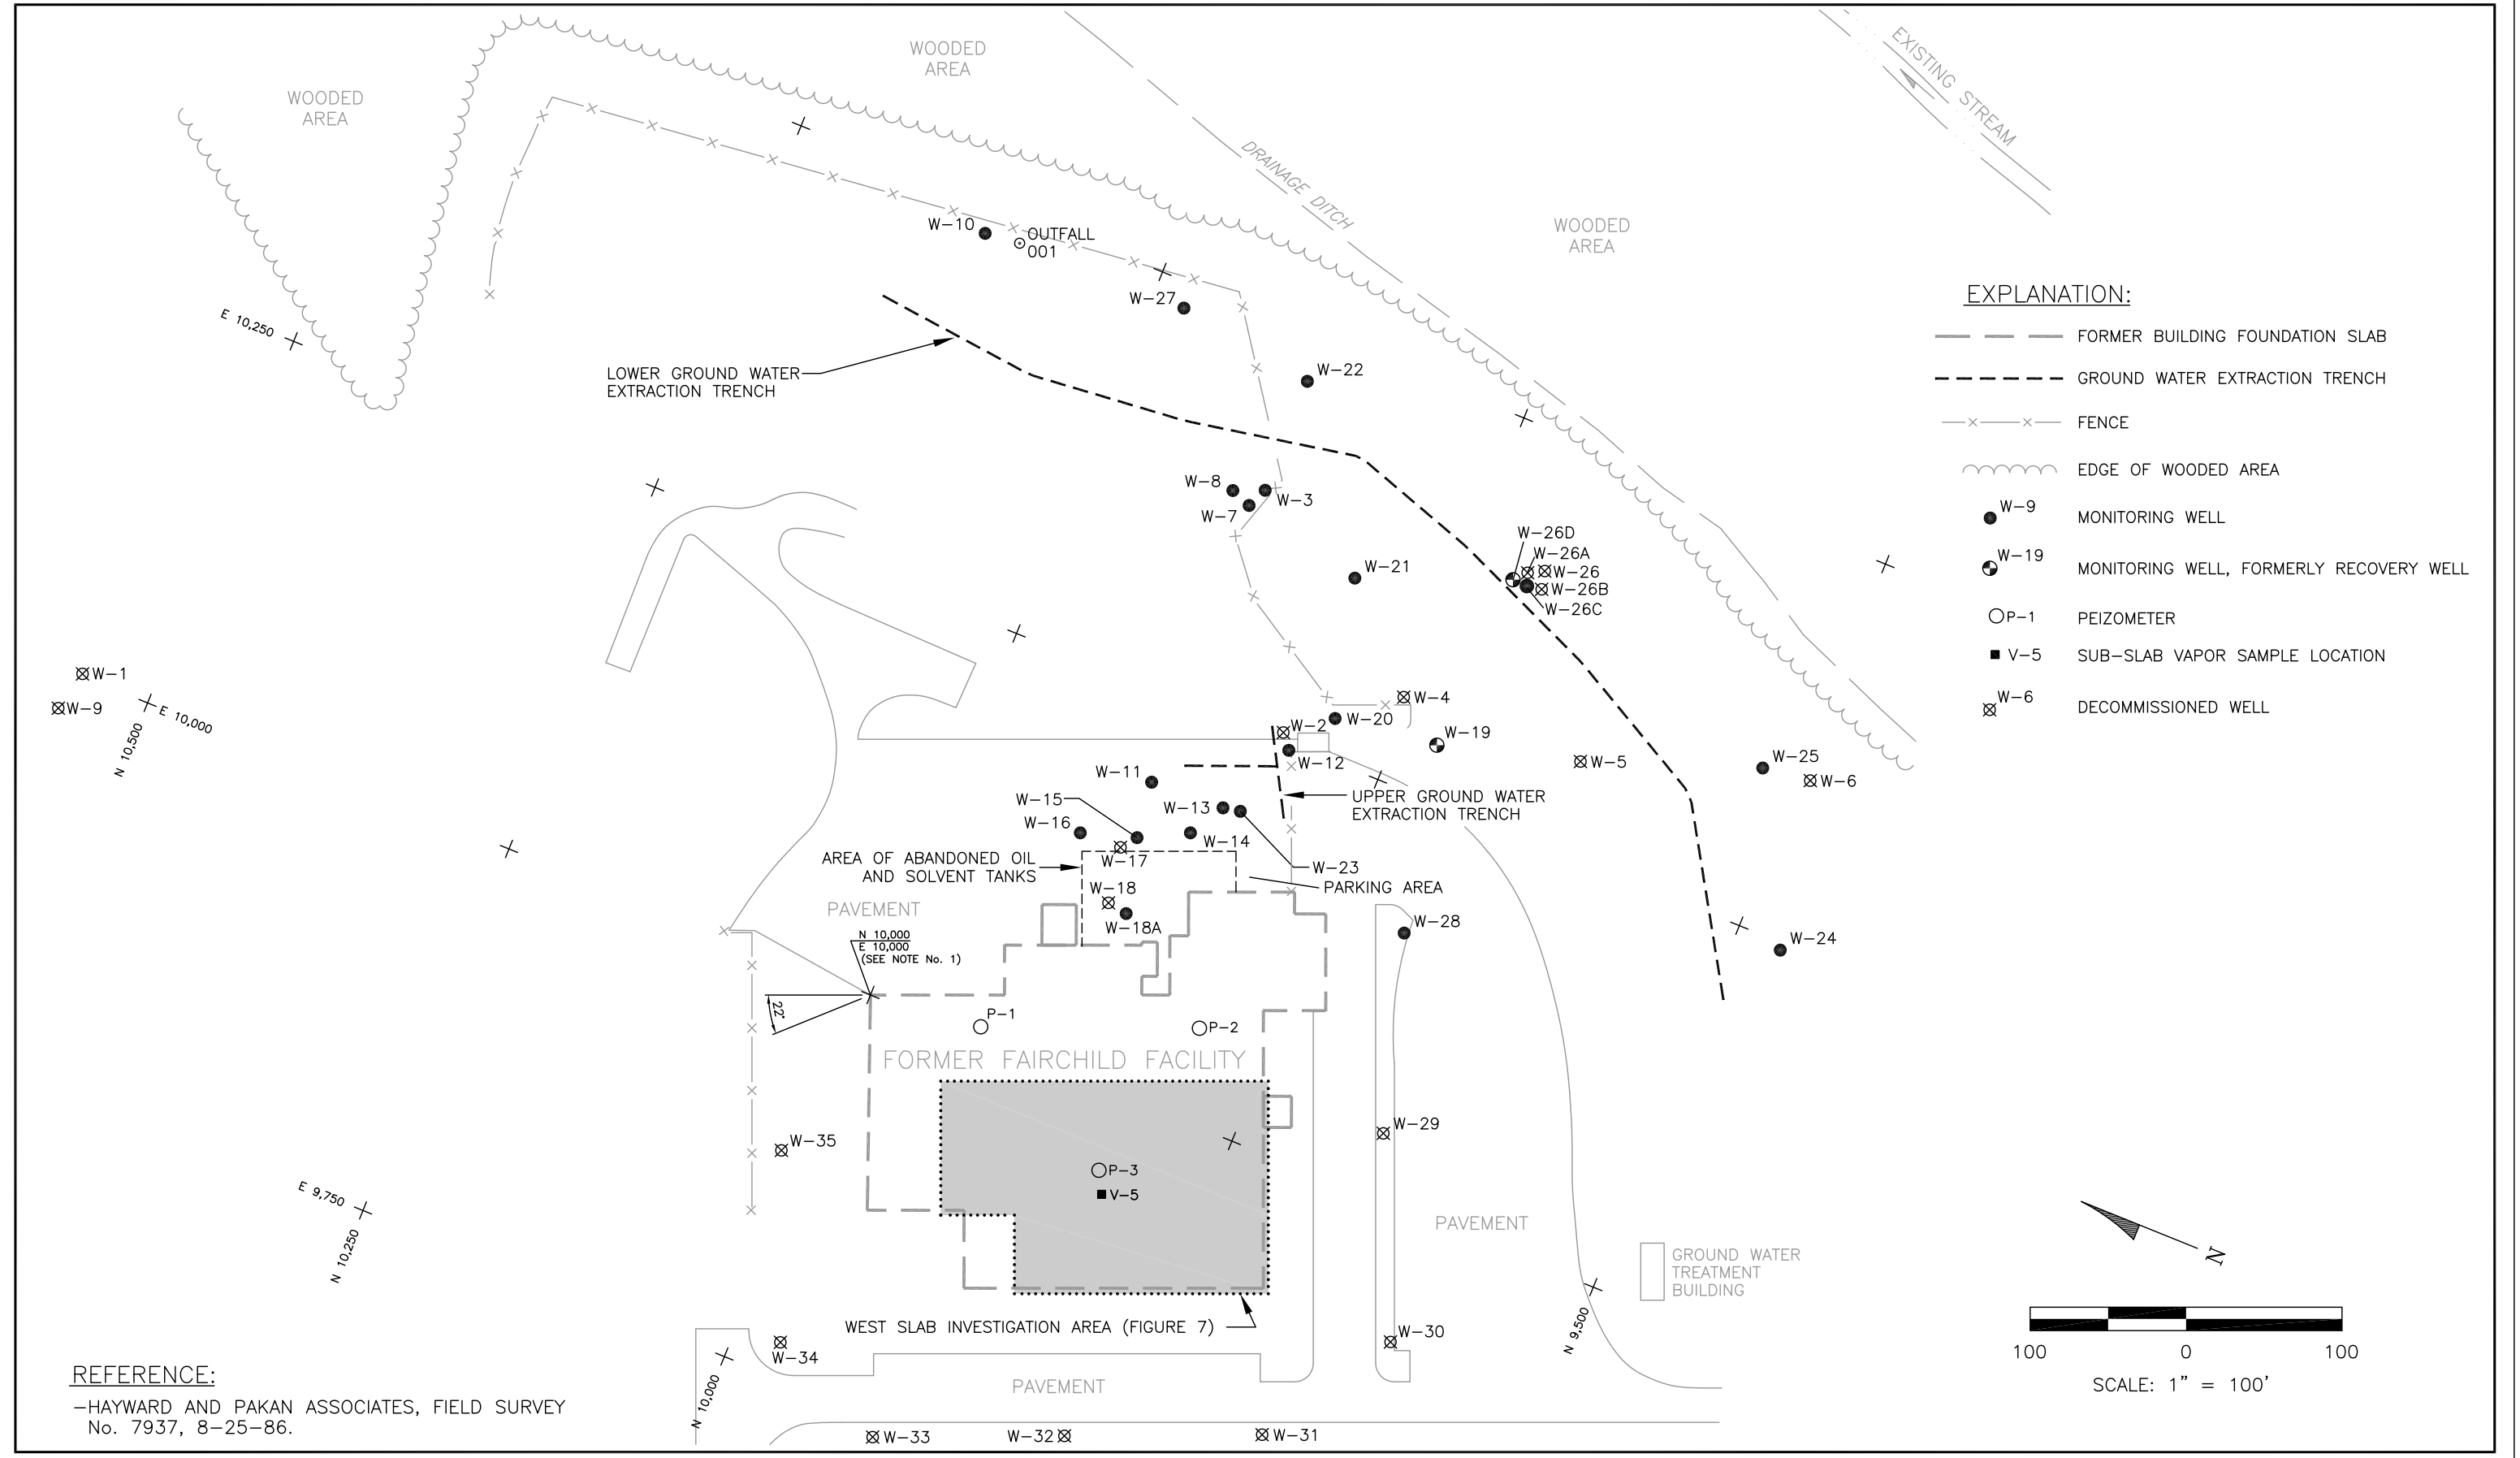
Site Plan and Monitoring Well Locations, Former Fairchild Facility, 91 All Angels Hill Road, Wappingers Falls, New York
